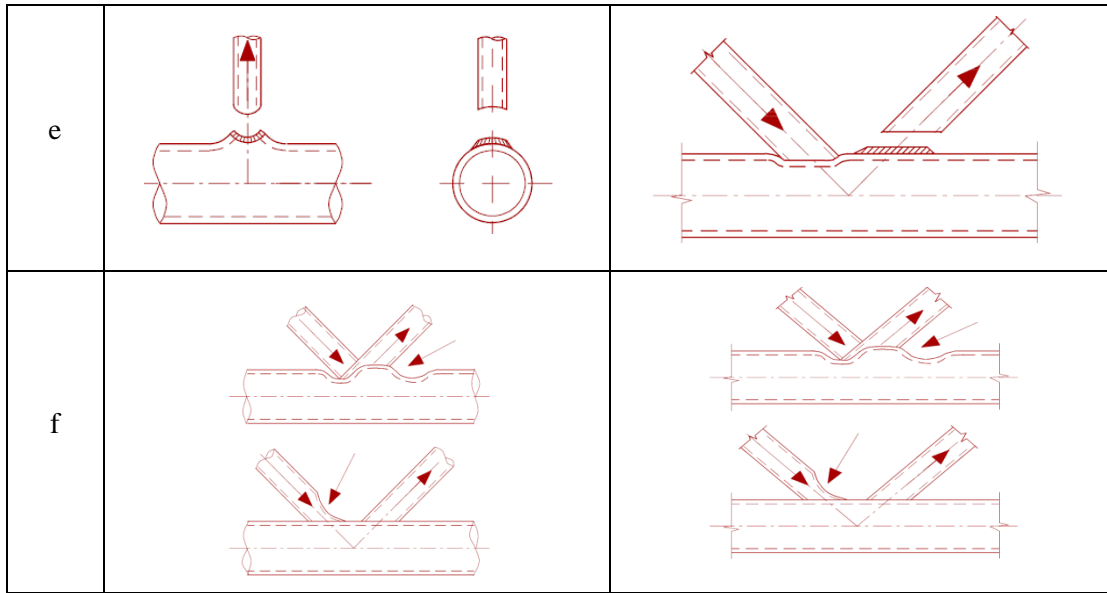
Welded tubular joint failure modes under brace axial load (CEN, 2005b)
